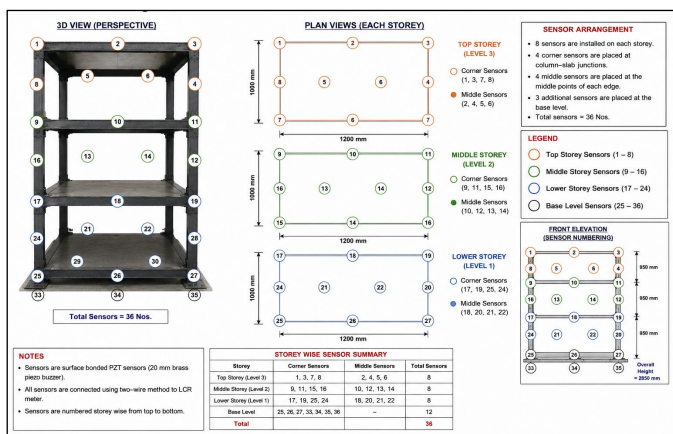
Arrangement of 36 Surface Bonded PZT Sensors on Steel Frame
